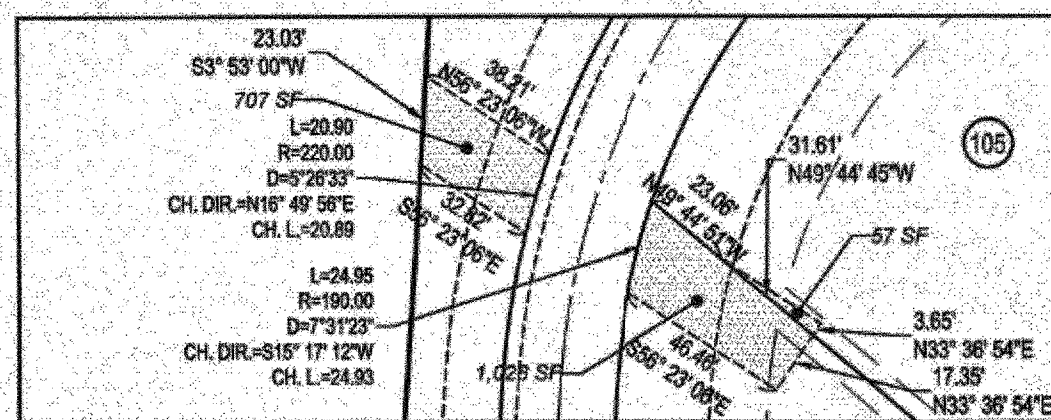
DETAIL "E" (PUBLIC DRAINAGE EASEMENT)
